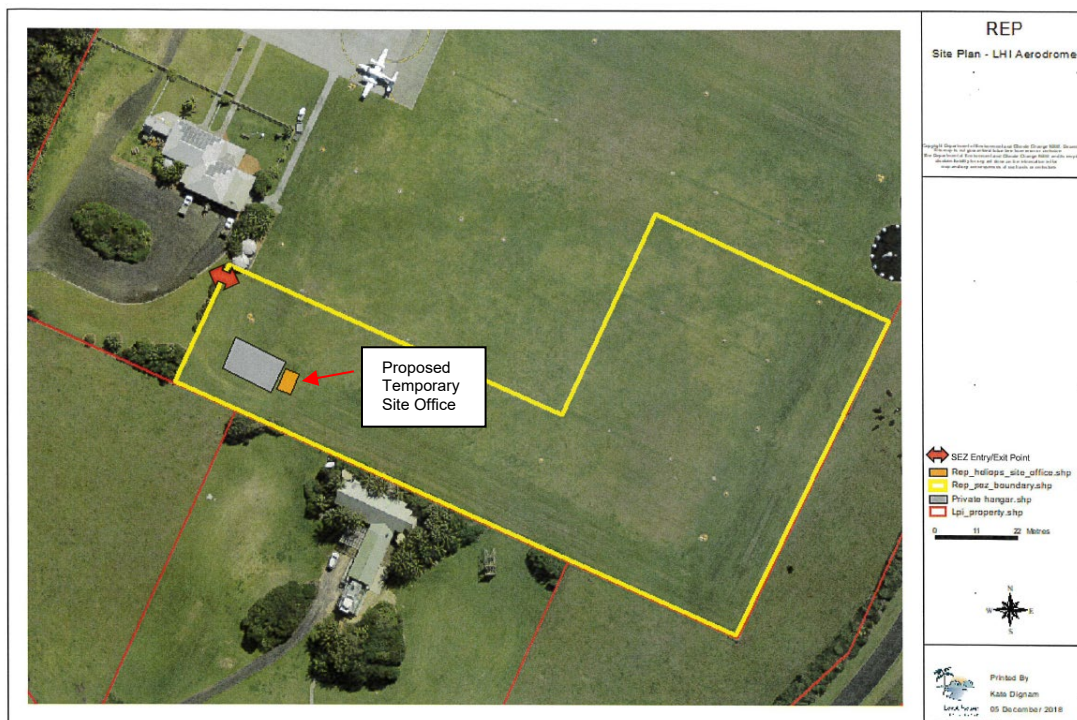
Aerial View of the proposed site office in relationship with the Lord Howe Island Airport and associated facilities.
